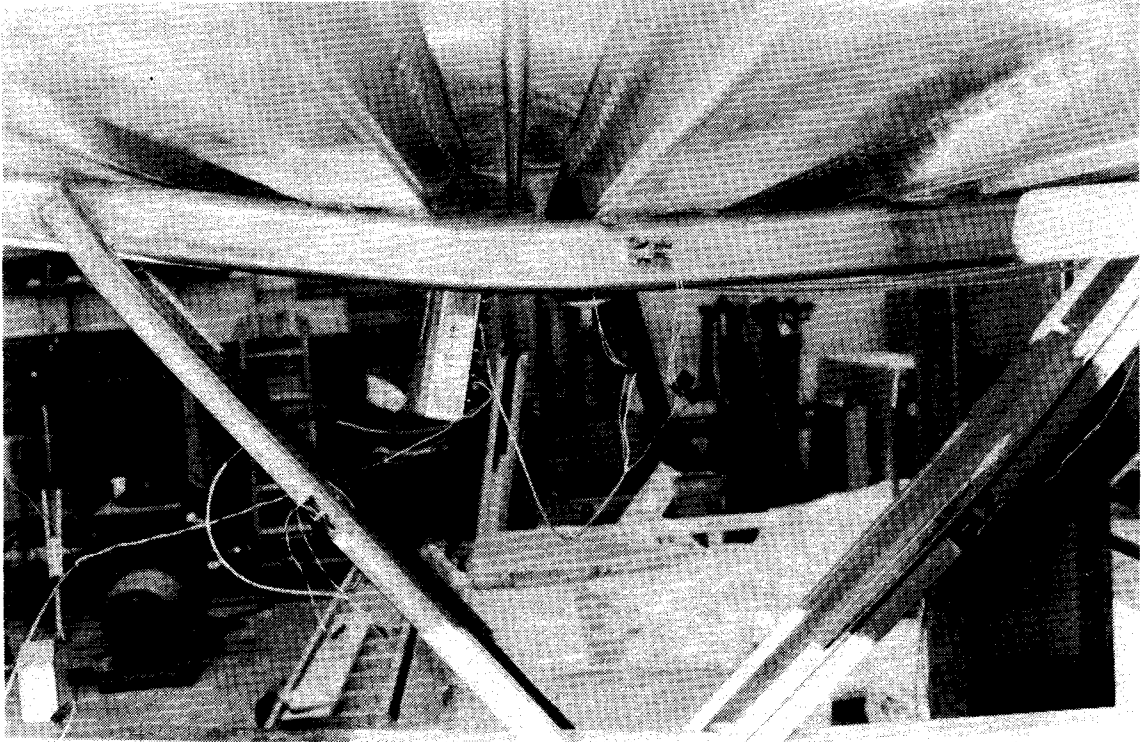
Distortion of truss components beyond maximum load - truss 1
